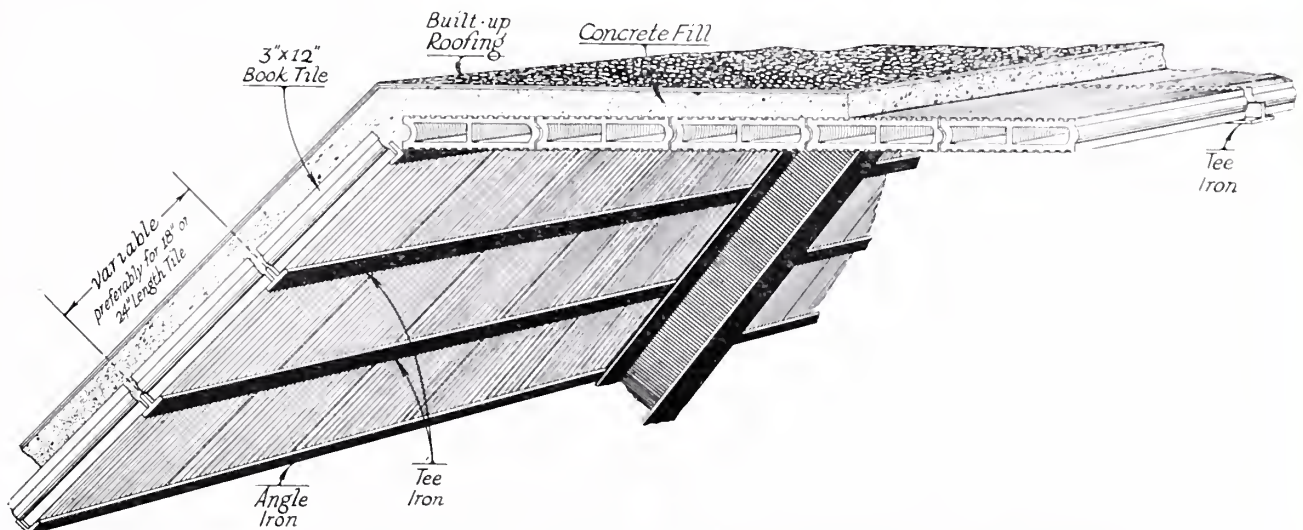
Illustrating the use of standard book tile in the construction of light weight fireproof roofs.
